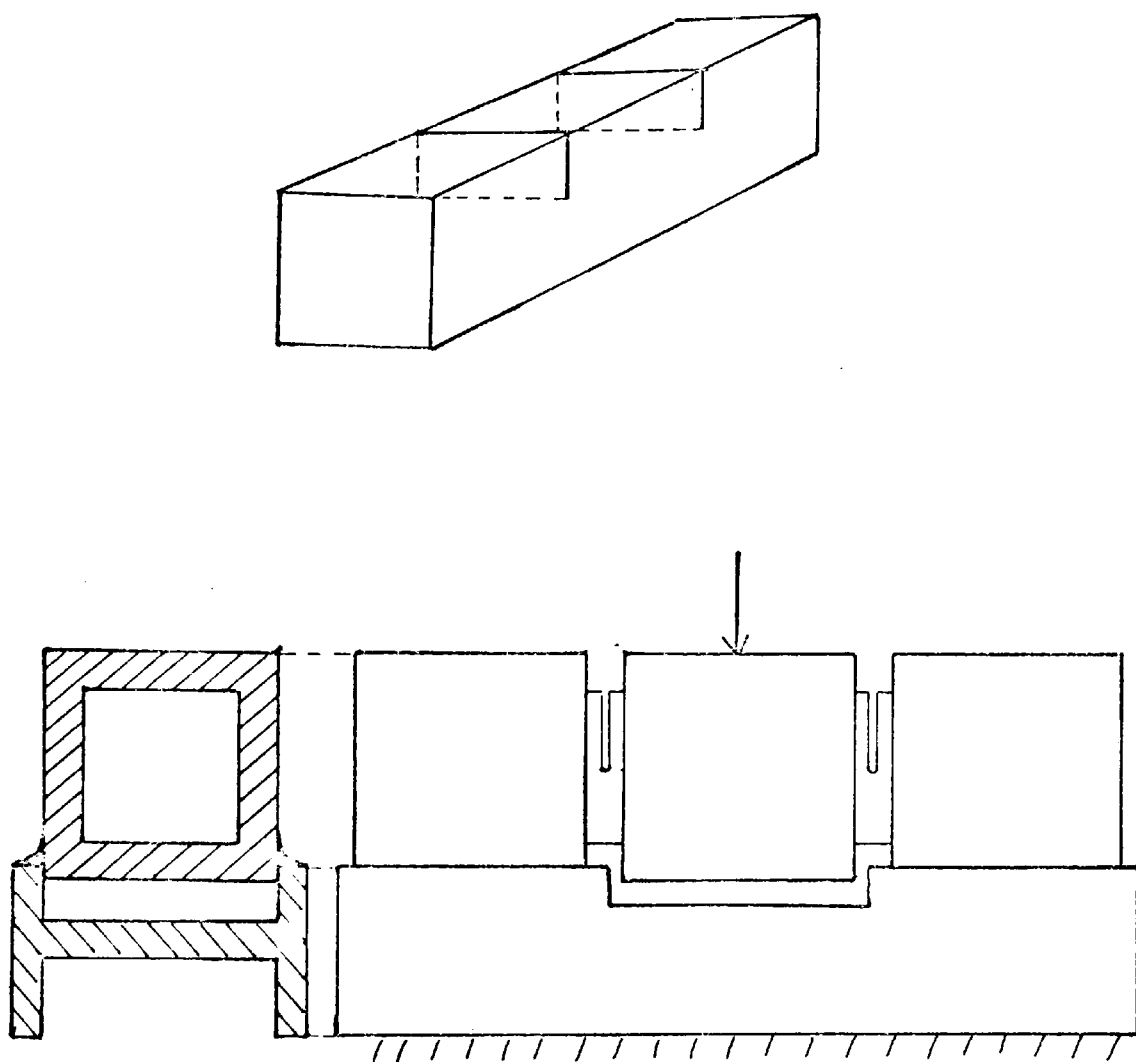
Proposed specimen shape and loading arrangement to measure K_{IIc} for concrete.
